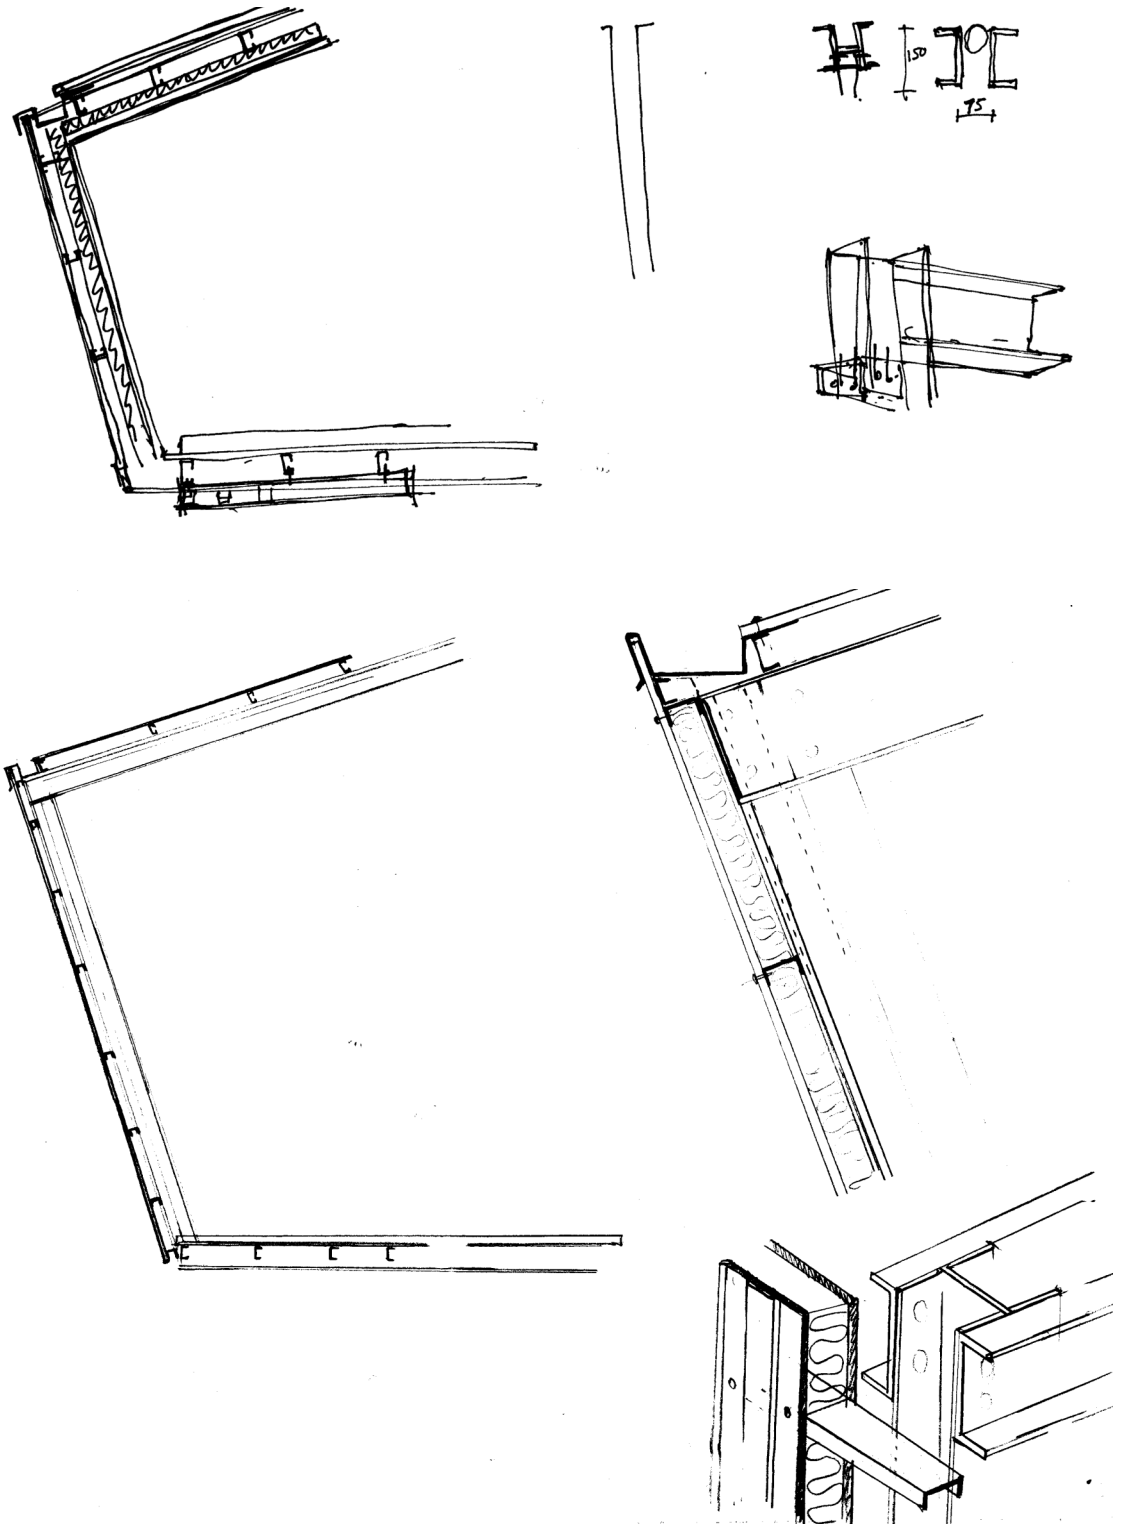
Journal extracts: Assembly of portal frame structure and roof detailing (Author 2020)
